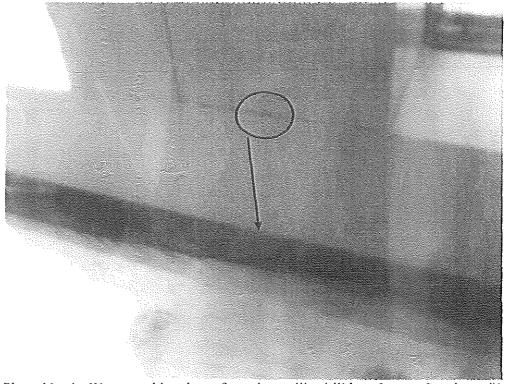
Water tracking down from the mullion/sill interface on Specimen #1
